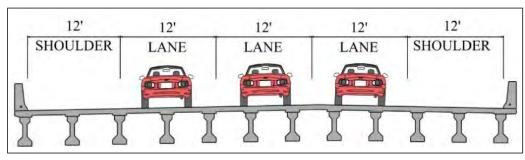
I-81 NB (B642) Over Lewis Creek *Note this is the NB bridge being shown; SB would be similar
